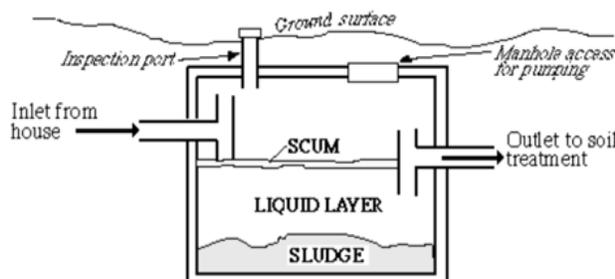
Typical cross section of a septic tank showing the layers of sludge, liquid, and scum. Newer tanks will have access ports for pumping. Older tanks may have a manhole cover that should be removed for pumping. Inspection ports on older tanks are not suitable for pumping.
